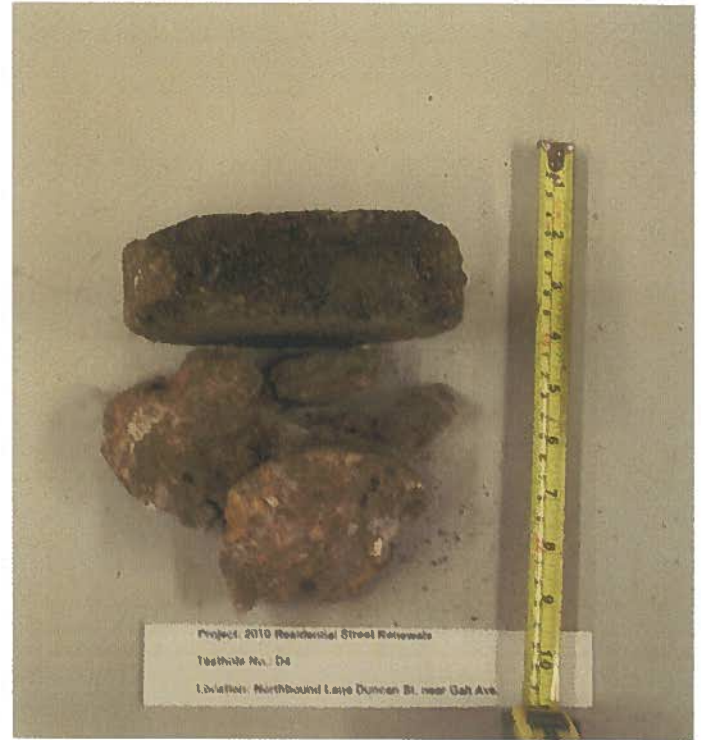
Test Hole D4: Duncan St. Northbound Lane, 75m S of S sidewalk at George Ave., 1.9m W of E curb
